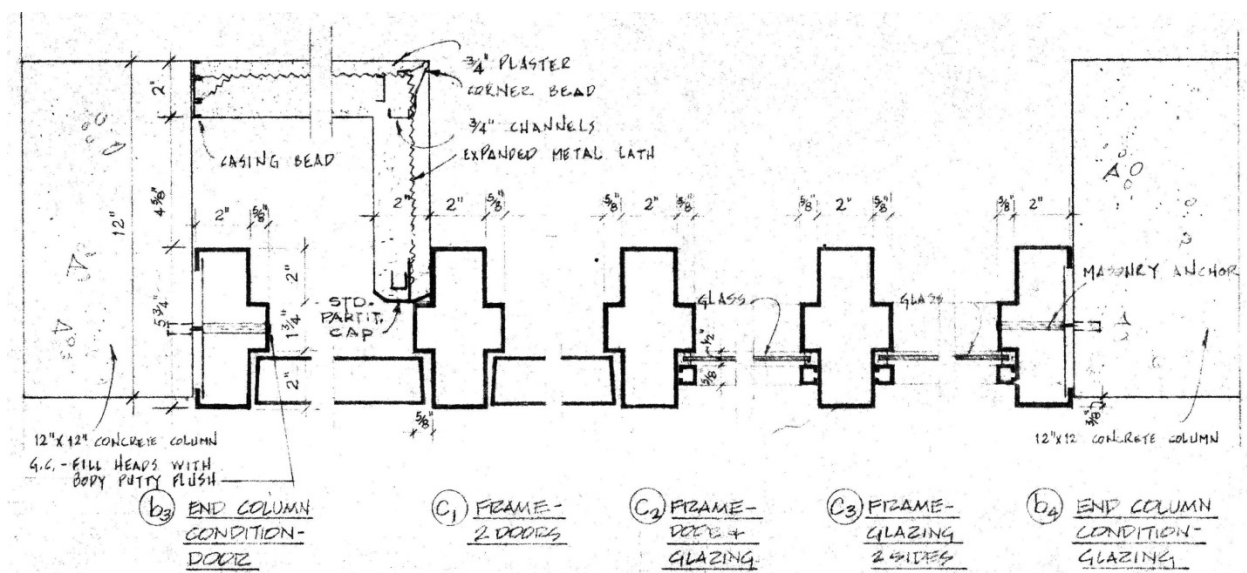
Typical steel-framed door and fixed lite assembly details. [From 1968 Drawing A-22.]
